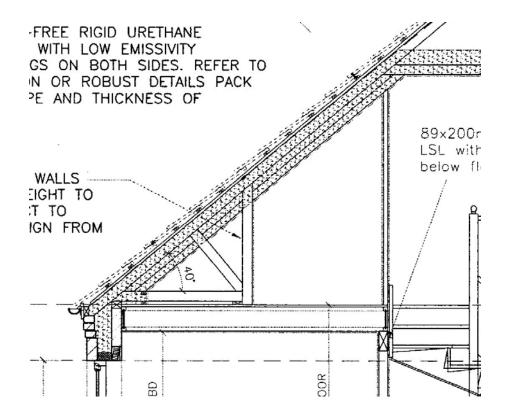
Wall-Roof Junction for Redrow Room-in-roof Derwent Design
